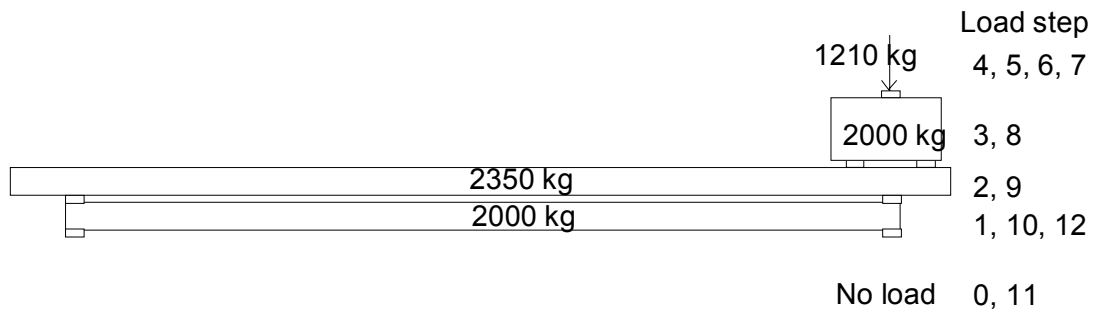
Loading arrangements at load steps 0, 1, ... ,12. The trimmer beam supports the right end of the lower slab.
